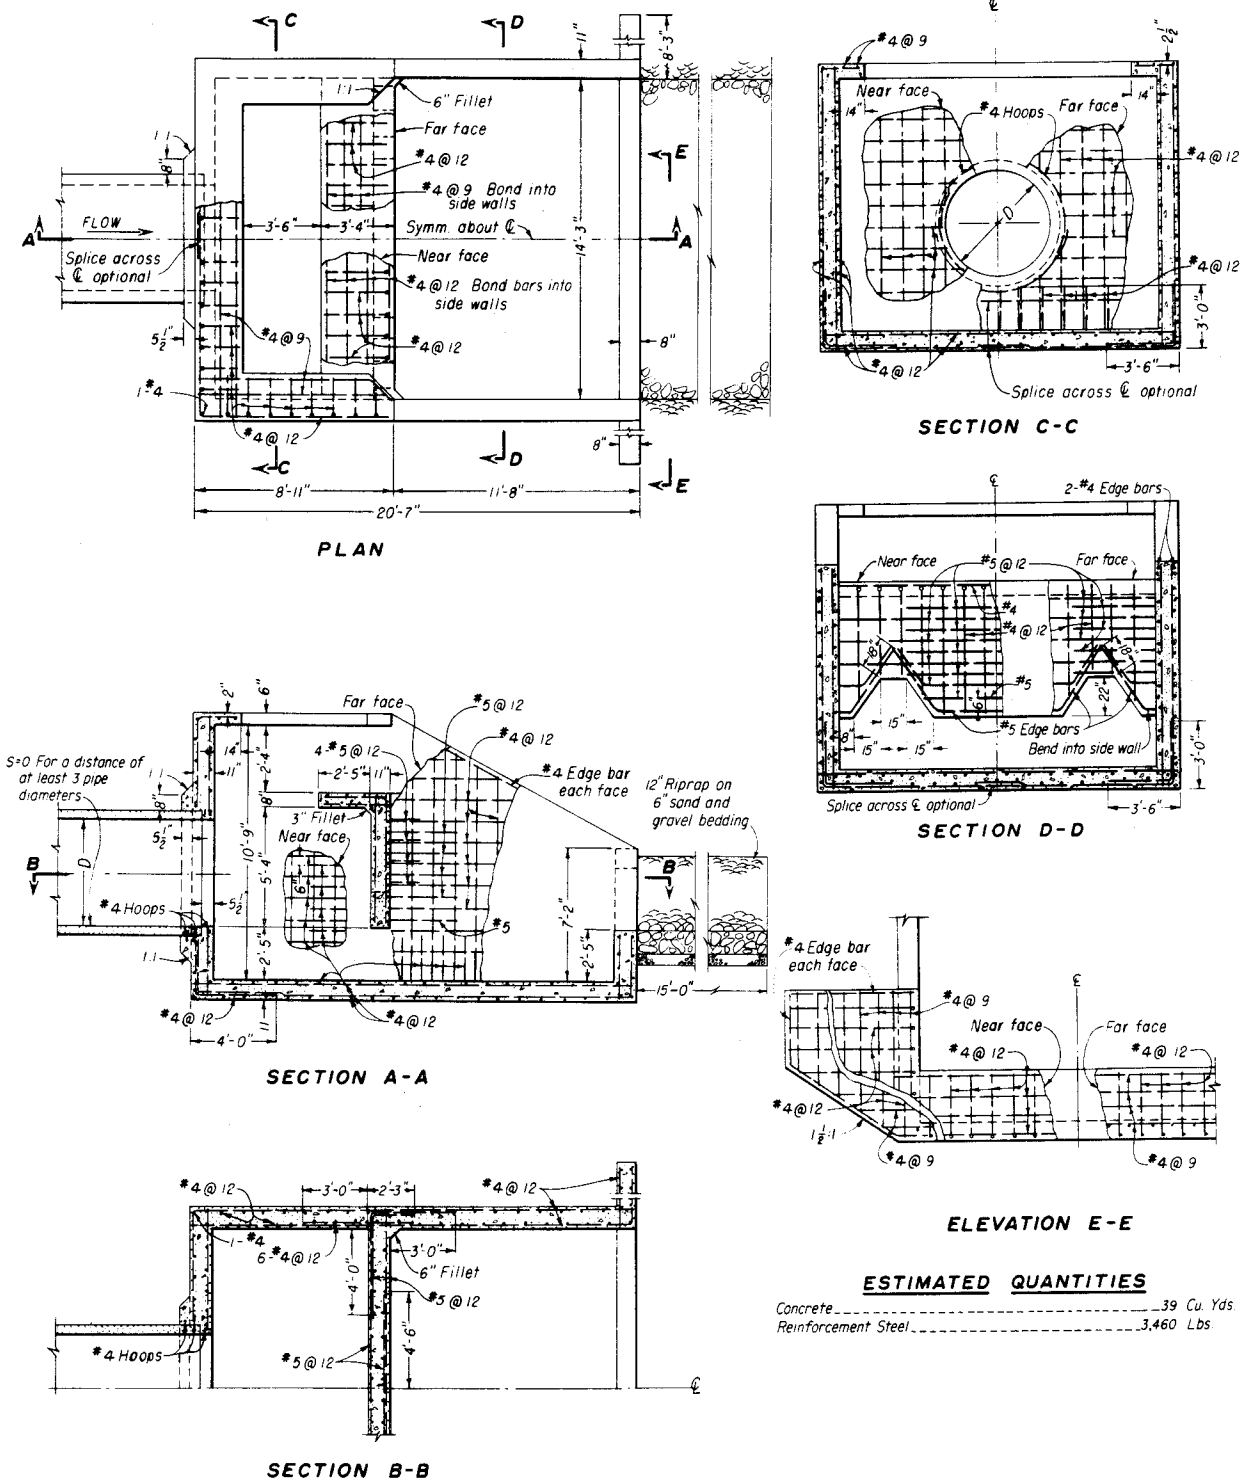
Type 10 baffled outlet. 103-D-1349
